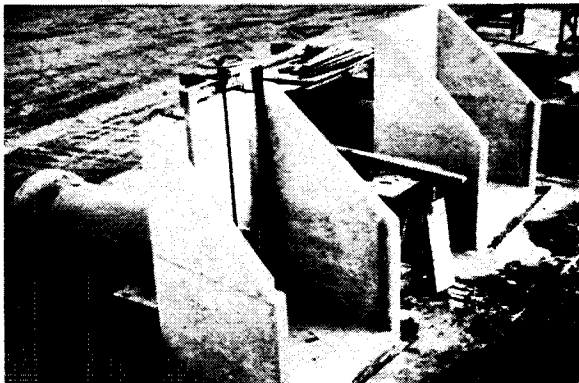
Precast concrete turnout inlets. PX-D-72616 D
